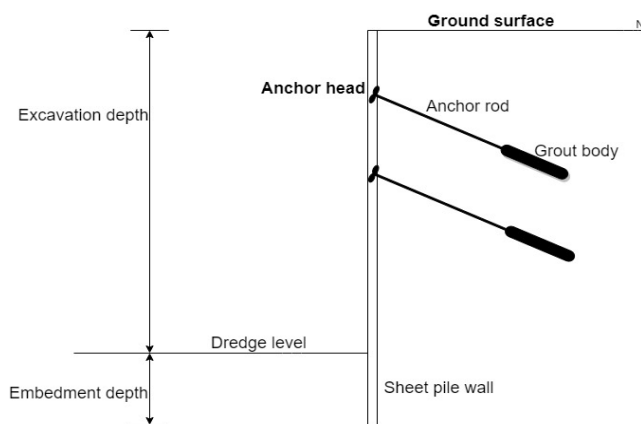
Structure of the prestressed anchor bar and sheet pile wall.
